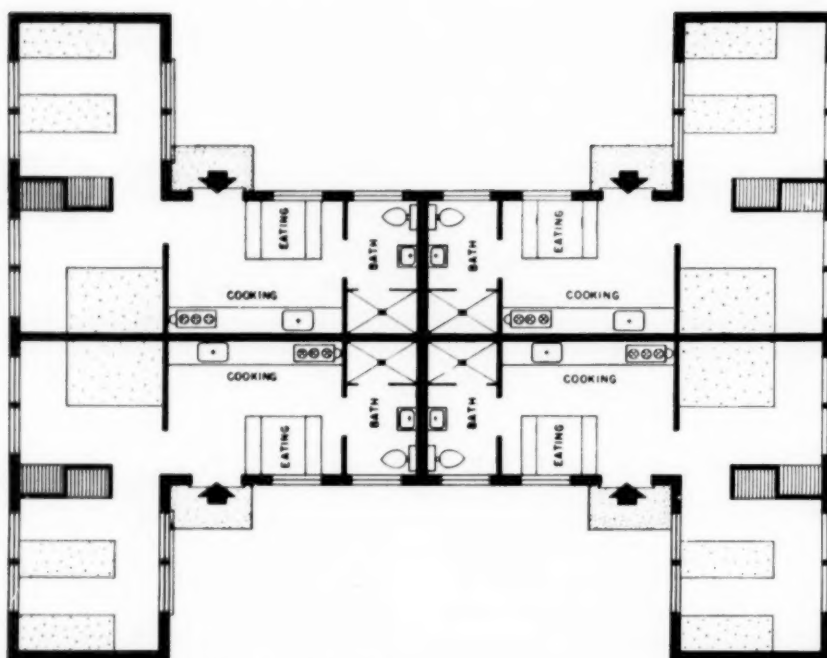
A variation of the plan shown in Figure 16 suitable for quarters used by camp manager, camp staff, and work group leaders. Individual bath facilities are included. Plan #2406
